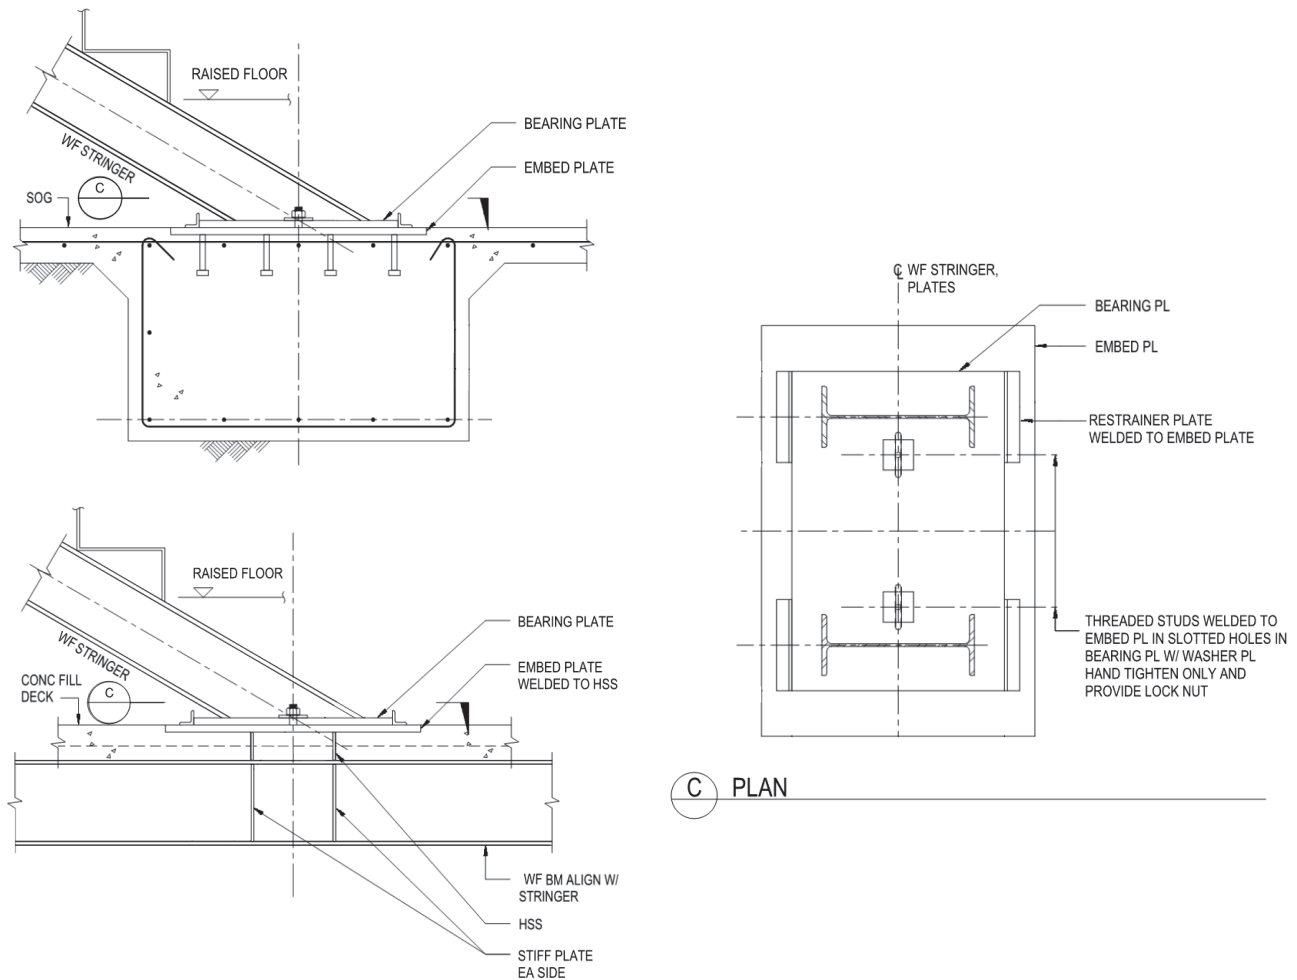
Examples of Slip Connections at Base of Stair – Longitudinal and Transverse Direction
